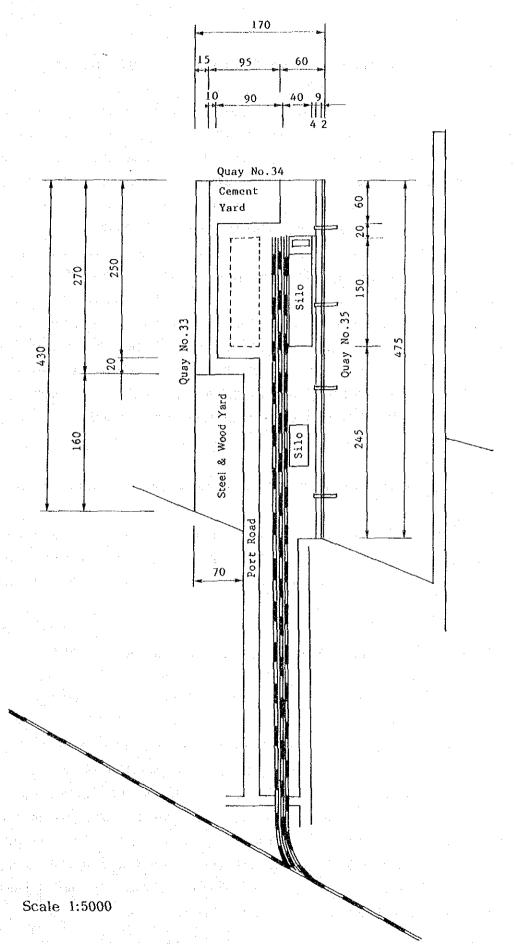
Layout plan of the Main Facilities for the Cereal Terminal
